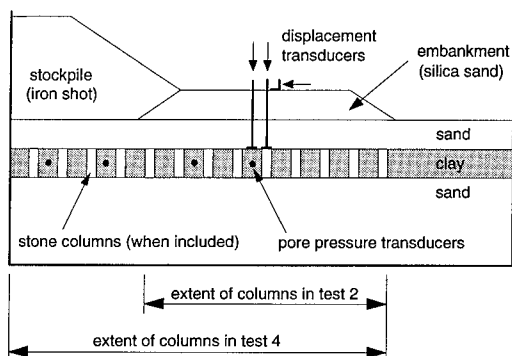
General layout of centrifuge models (precise layout varied between tests).
